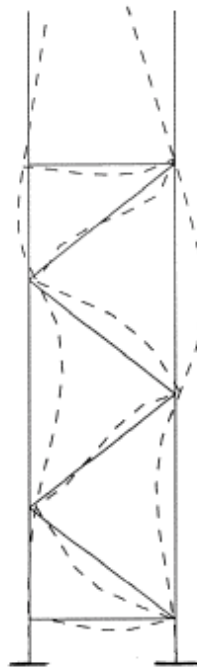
Buckled Shape for Truss Sign Support Structure with Diagonals Rigidly Connected to the Columns
